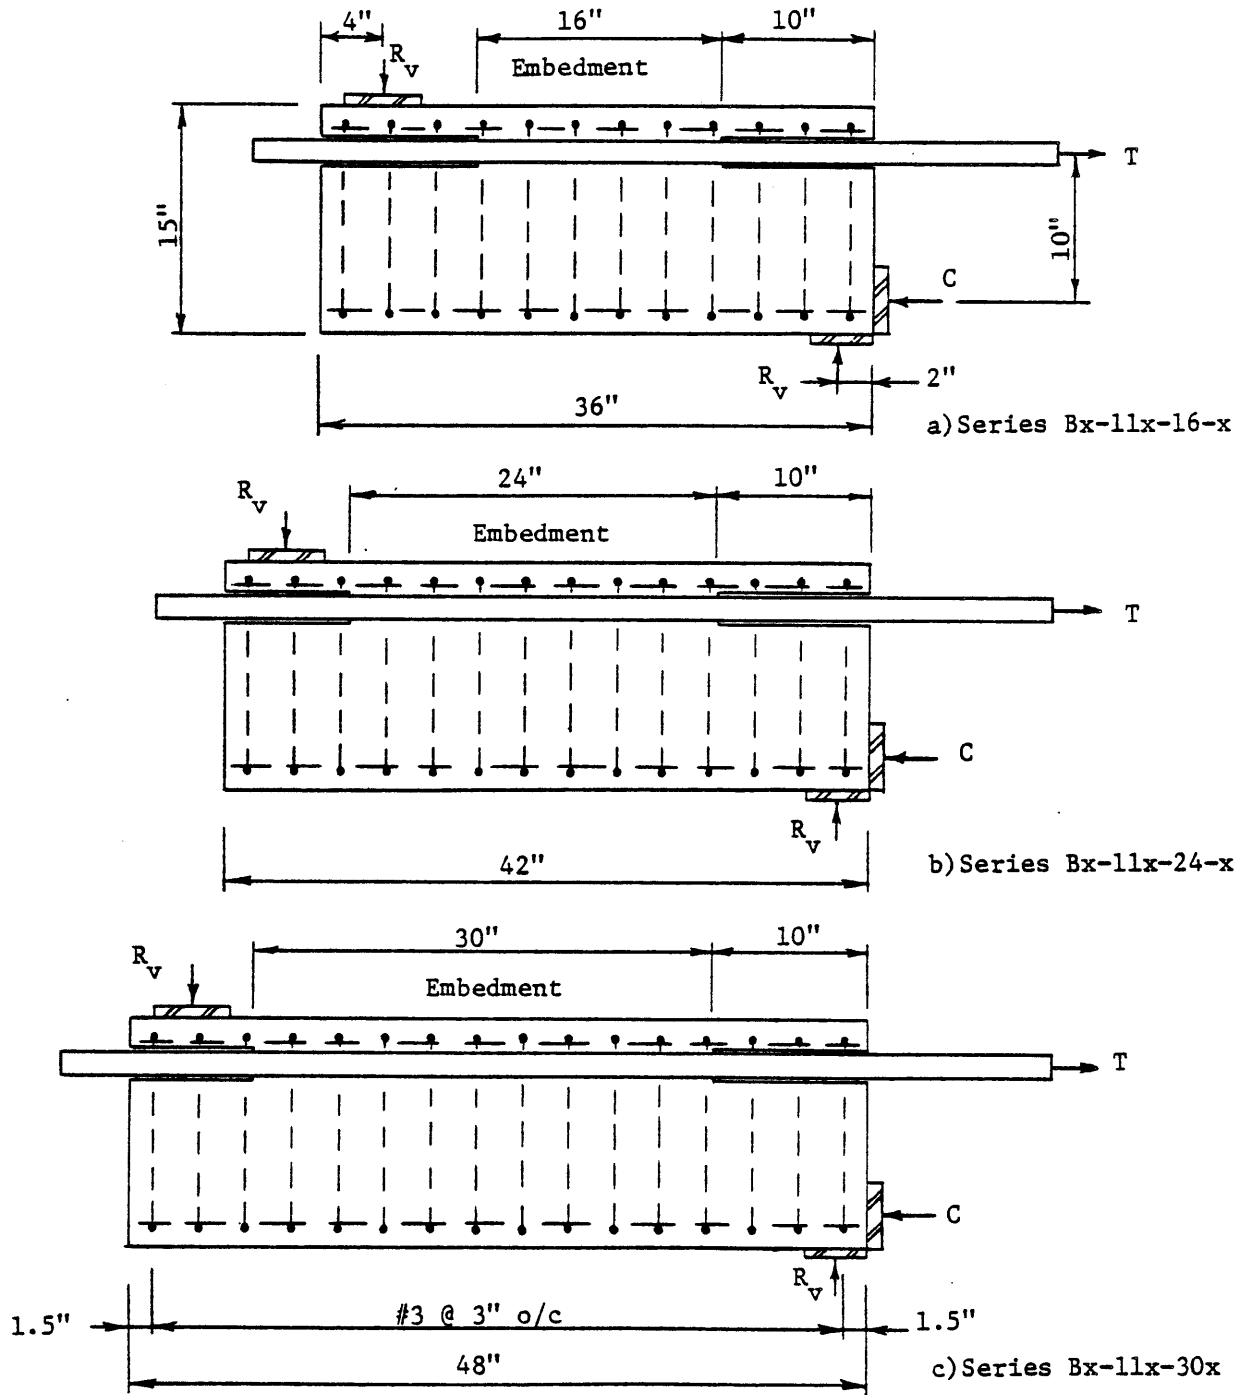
Beam End Specimen Details with No. 11 Bars
